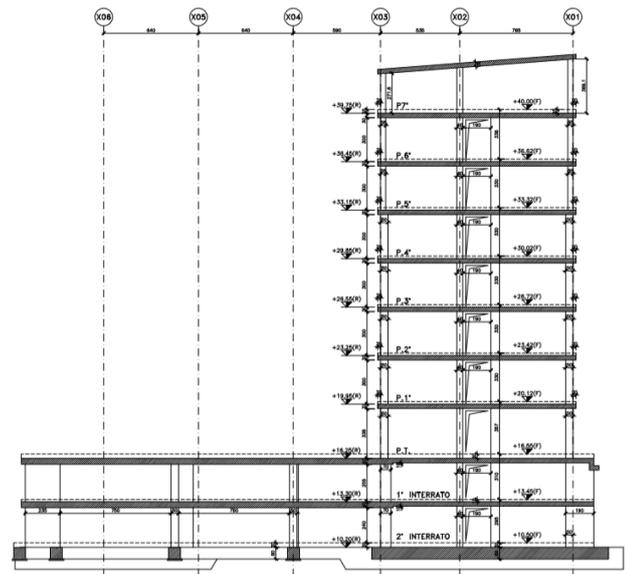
Building ENI2: vertical section /Edificio ENI2 sezione verticale.
